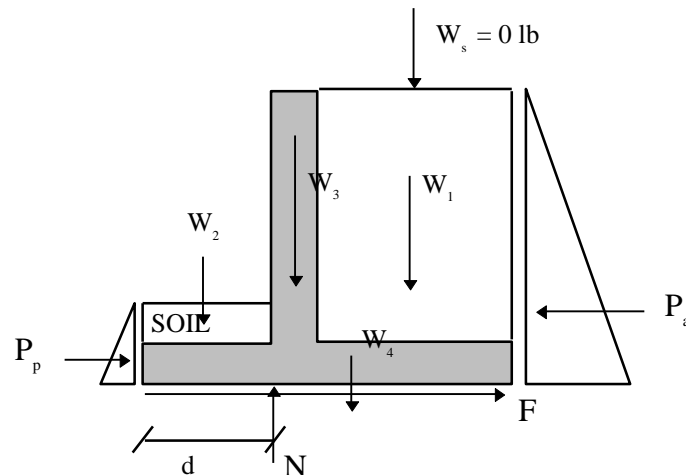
FBD of Example Problem Cantilevered Retaining Wall
